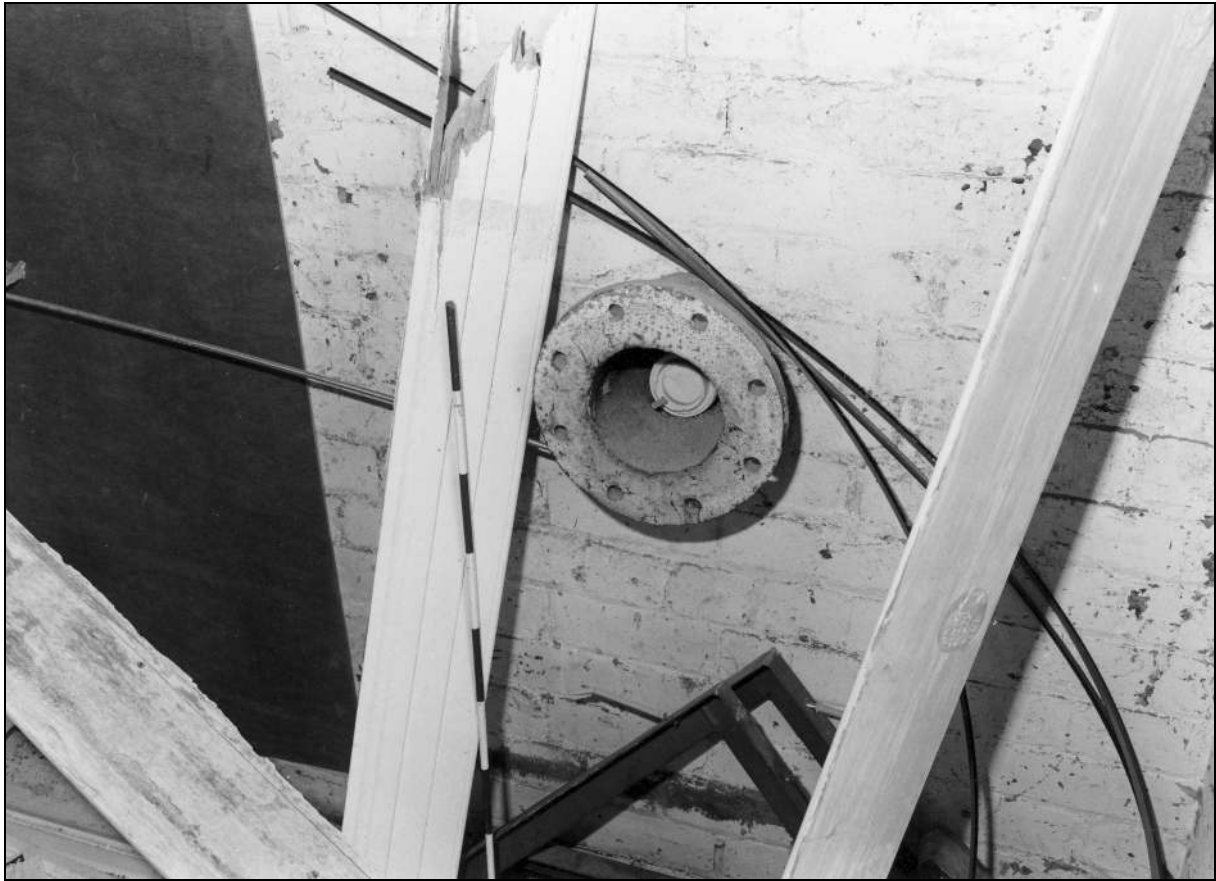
Pipe supplying adjacent building to west of water tower (inside building) (film 8, frame 13)
